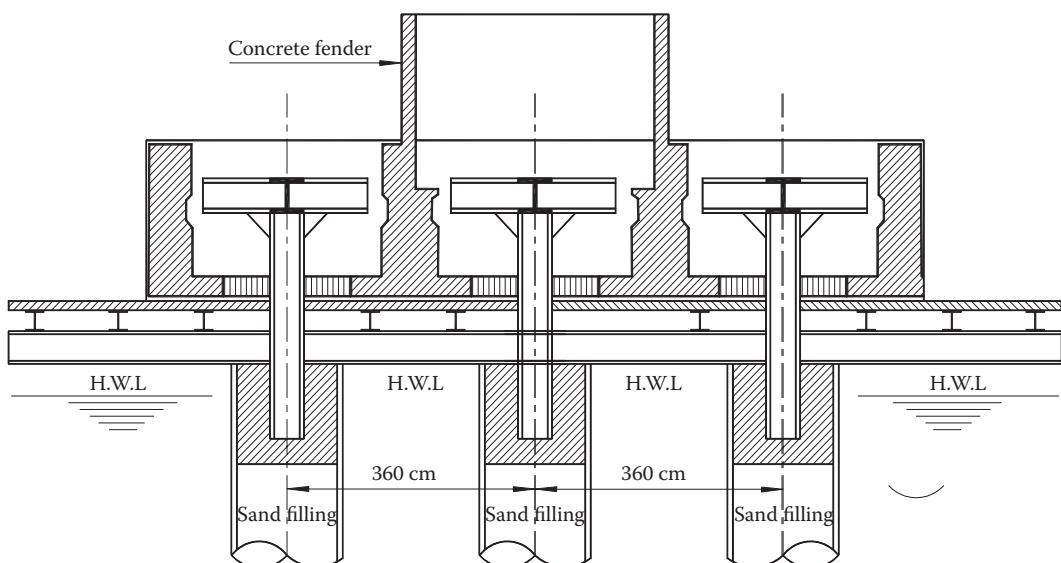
Pouring the bottom, forming working rooms, and pouring around working rooms (step 12).
